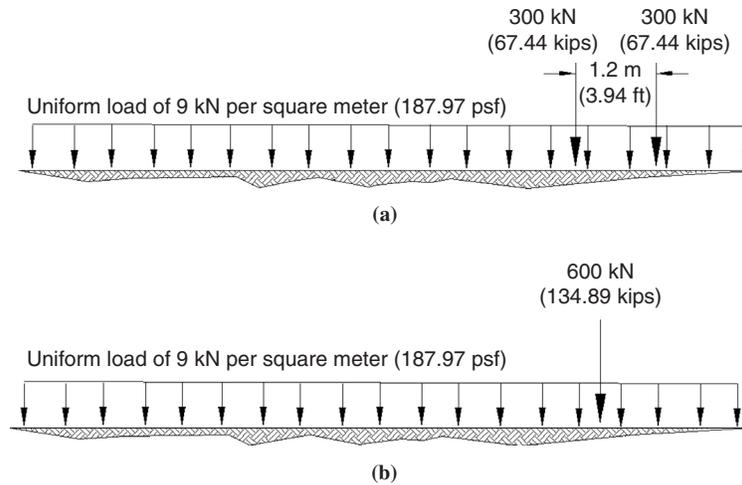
Bridge design loading configuration used in Europe: (a) spans of less than 10 m and (b) spans of 10 m or more.
